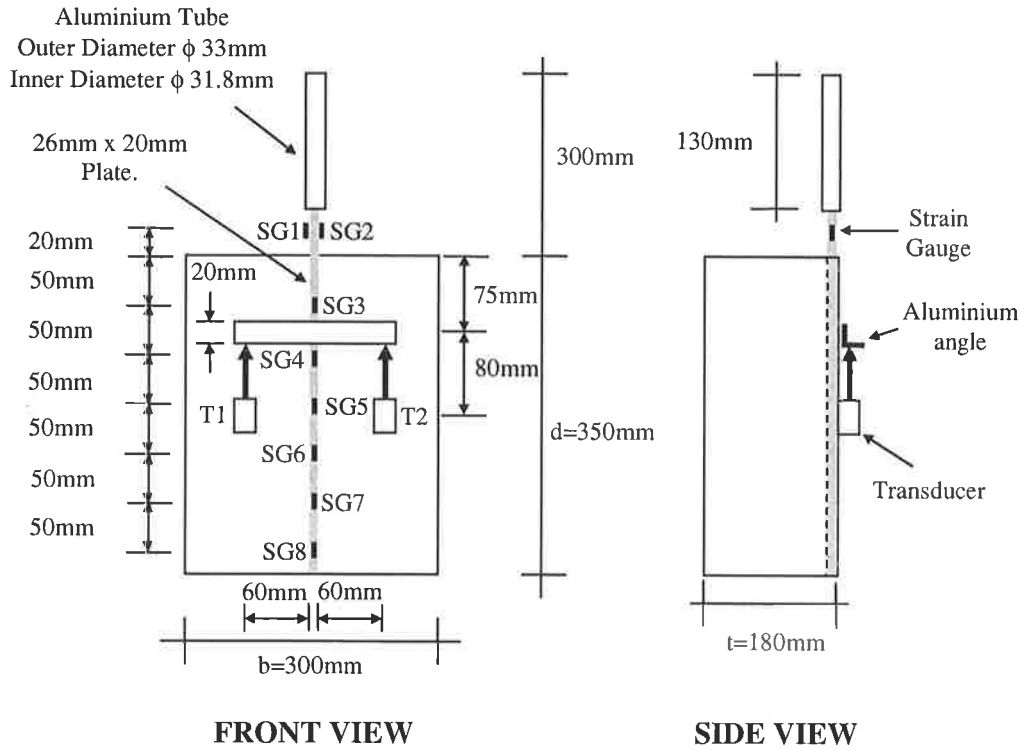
Pull test of 26mm x 20mm FRP plate details.
